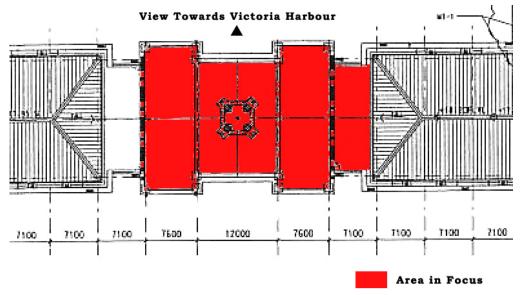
Existing Roof-Level Plan of the Clock Tower Building
